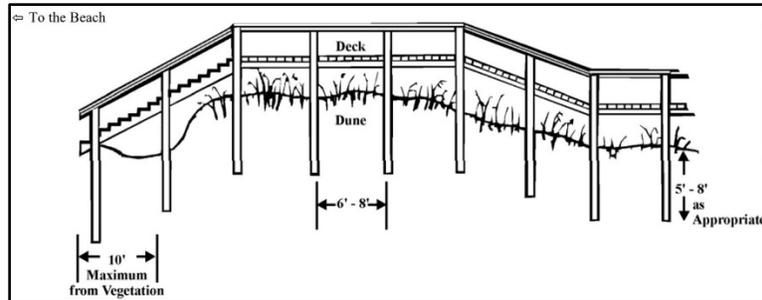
Pier-Supported Walkover with Steps (FDEP 2016)
